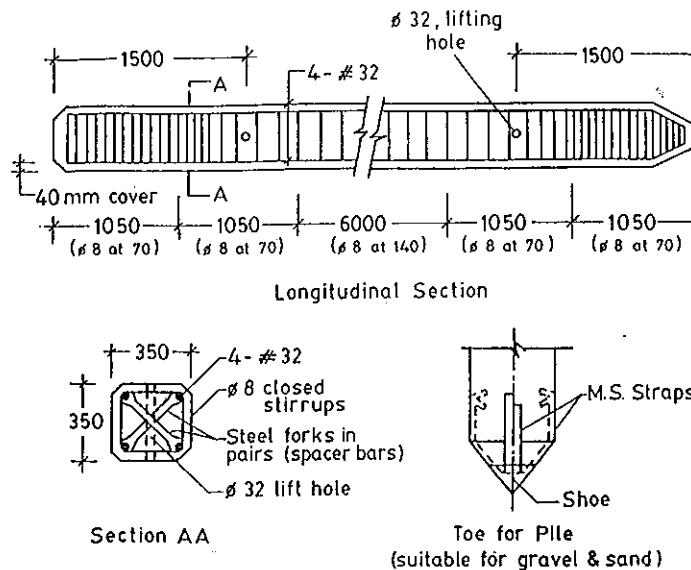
Typical Details of Reinforcement in a Precast Concrete Pile
